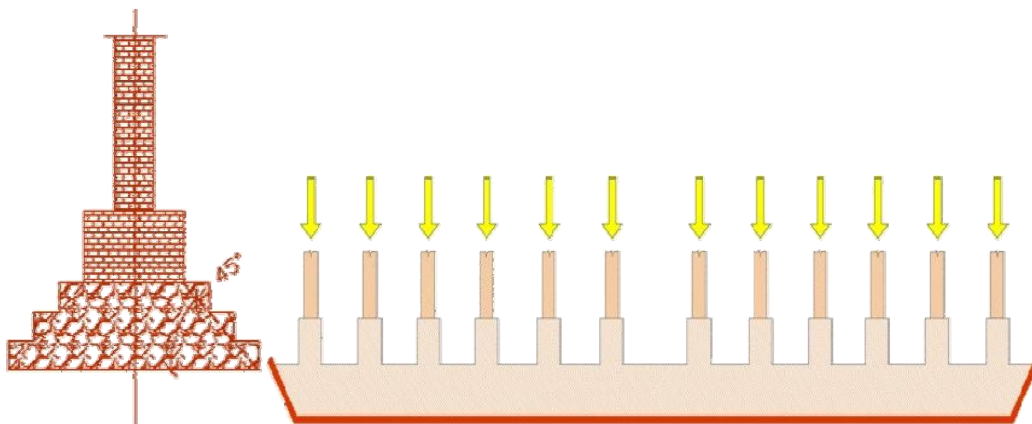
Strip foundations, bearing walls & transmission of loads on the foundations.
